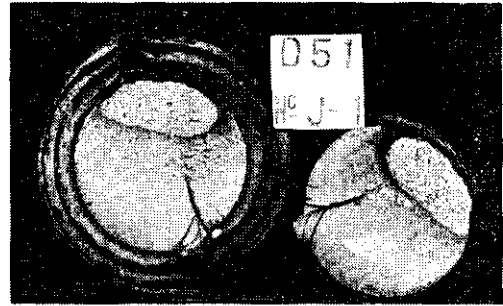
Typical fracture surface of gas butt welded joint
